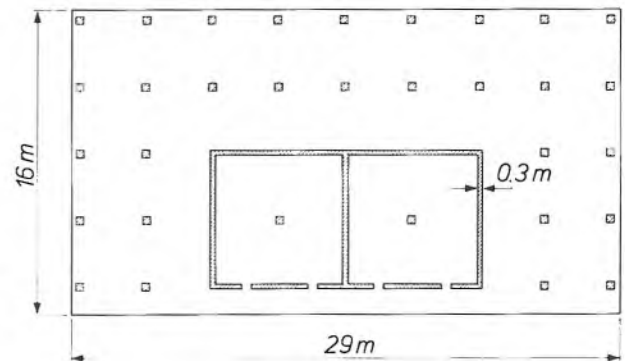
Horizontal cross-section through the columns and walls that connect the foundation floor and the floor for the wafer steppers. The two floors and the walls form a stiff concrete box construction.
